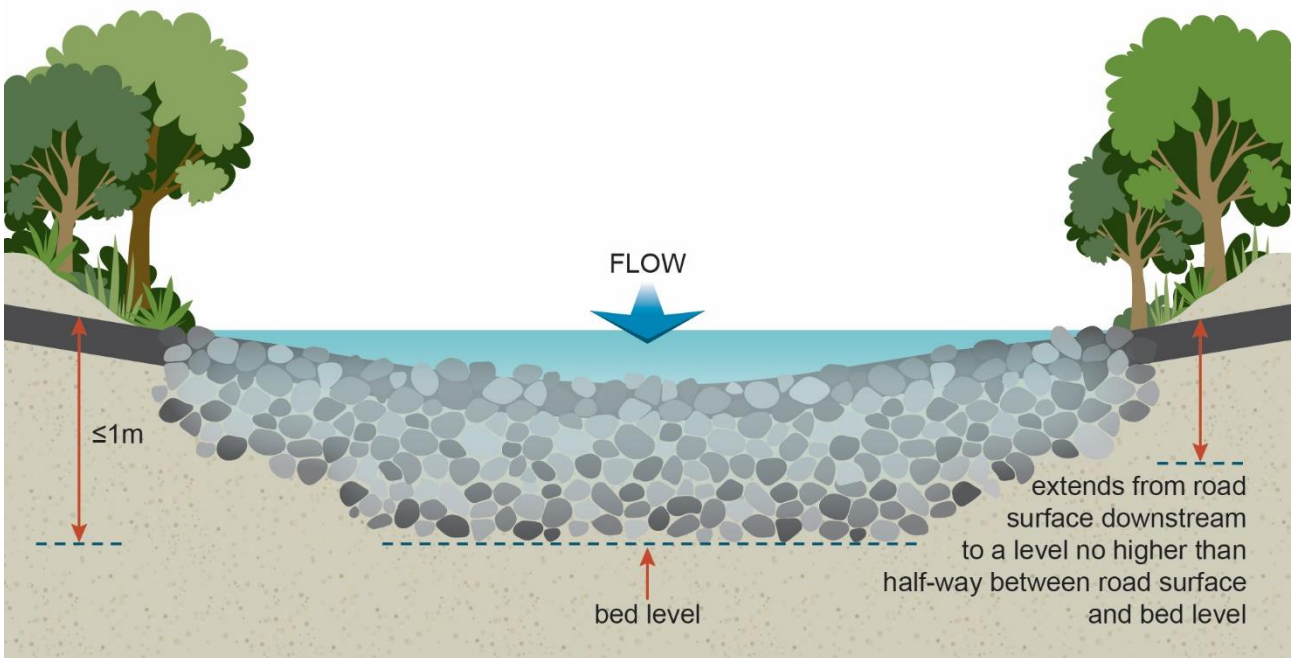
Interim rocked fish ramp on existing causeway (cross-section of waterway) – purple, red, amber and green waterways
